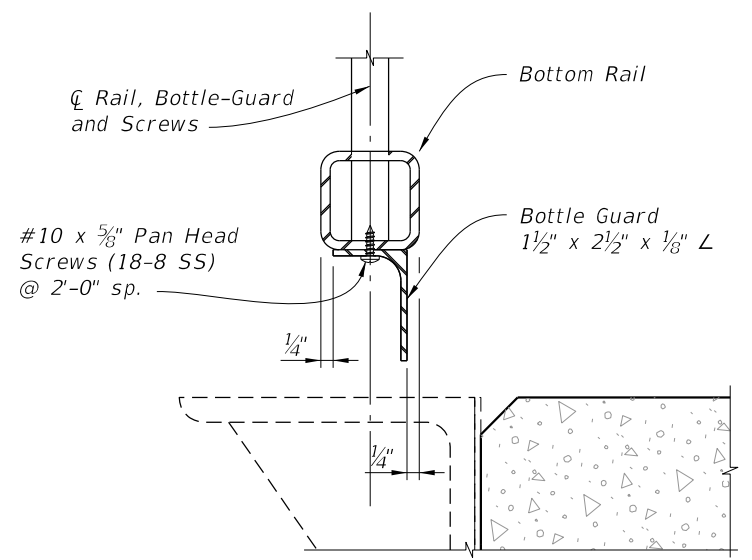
DETAIL "A" - SECTION AT INTERMEDIATE OPEN JOINT
